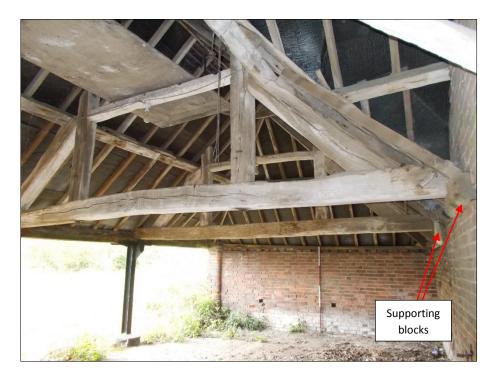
Room G18, the roof trusses, looking south. 2m scale rod.
